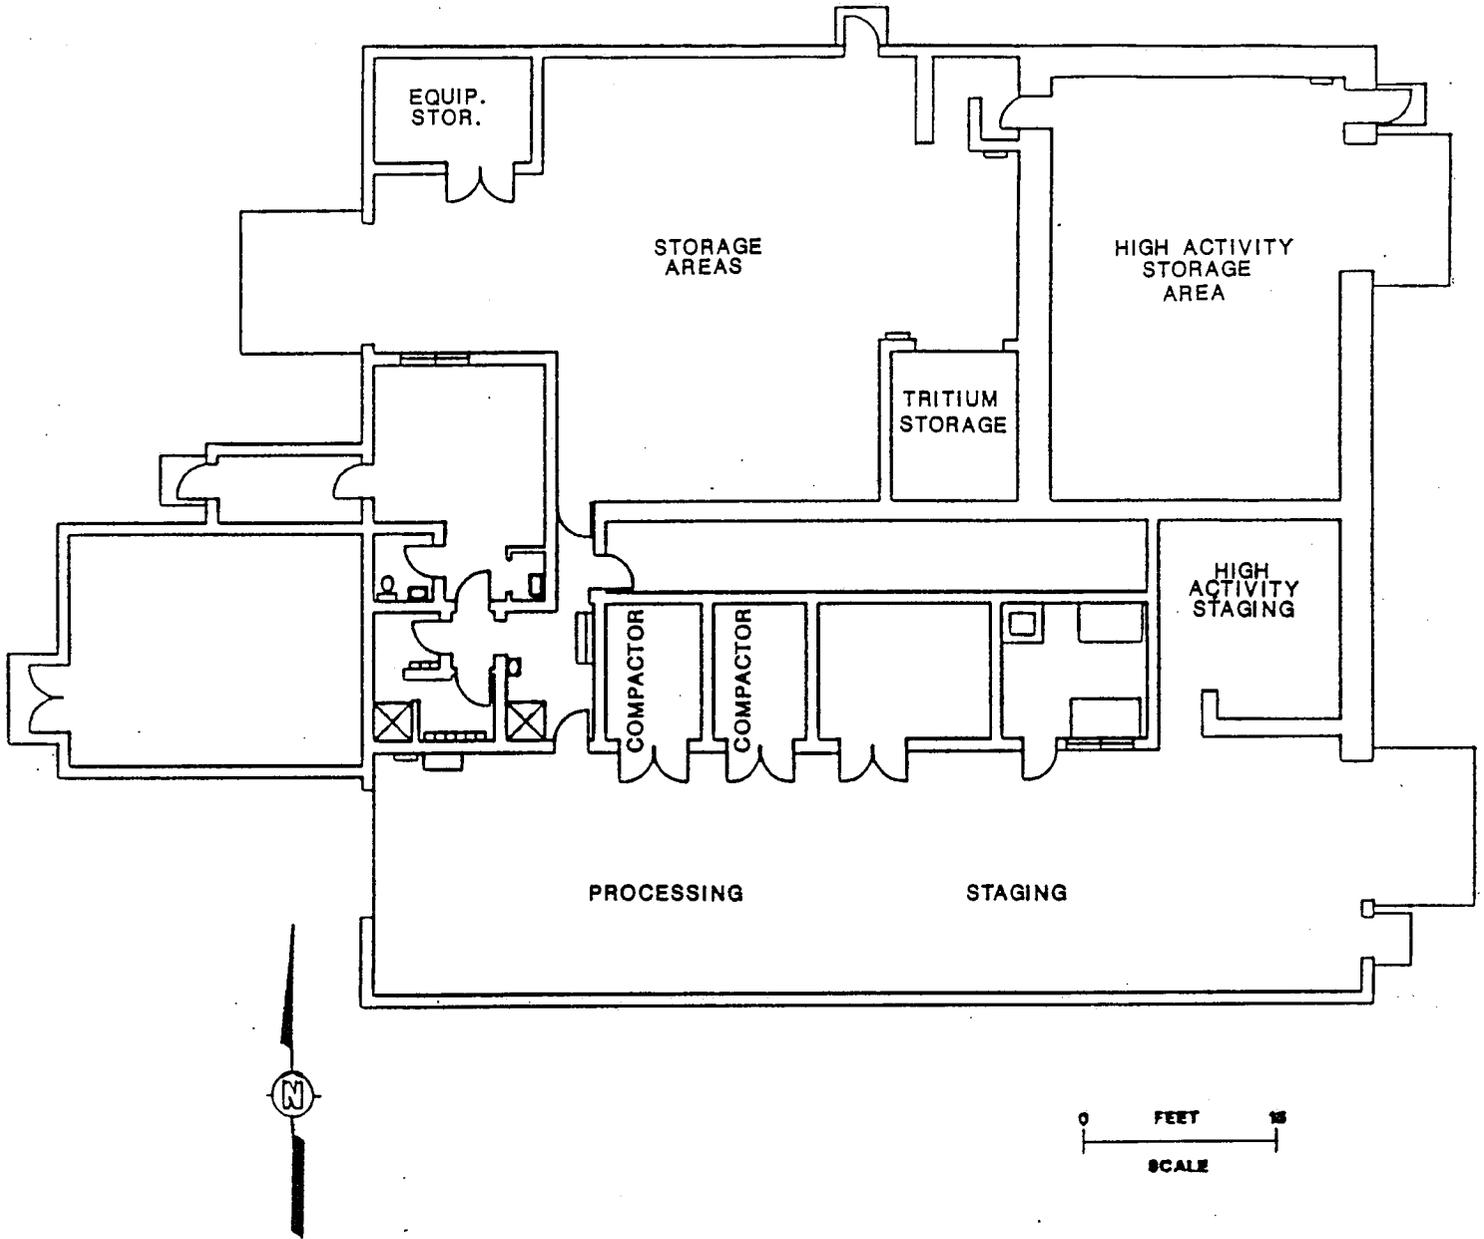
BUILDING 6920, RADIOACTIVE AND MIXED WASTE MANAGEMENT FACILITY TECH AREA III
